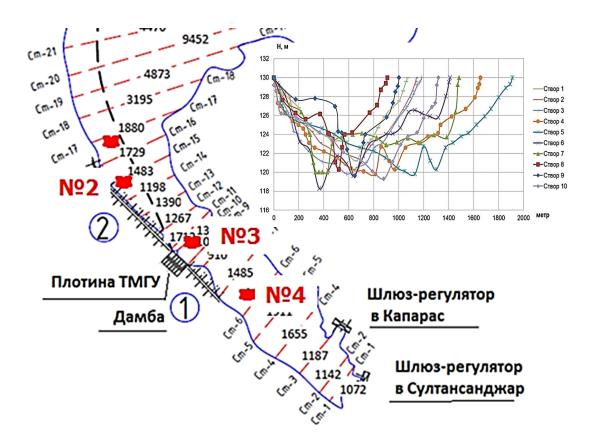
Schematic plan and sites of the Ruslovoye Reservoir near-dam section.
